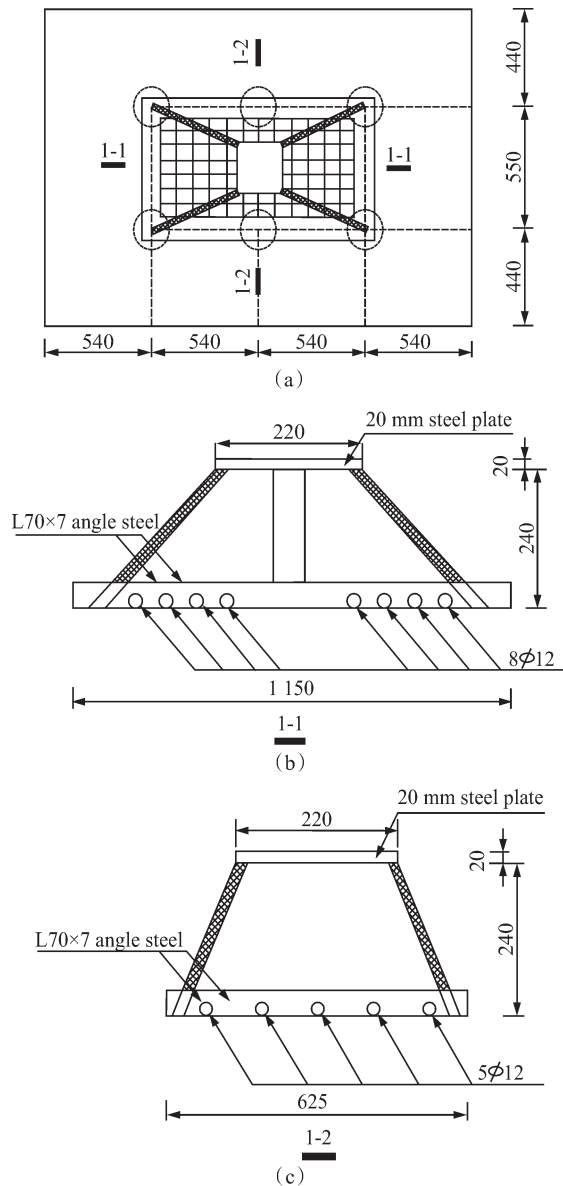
Truss reinforcement diagram of S4 (unit: mm). (a) Plan view; (b) Section 1-1; (c) Section 1-2
